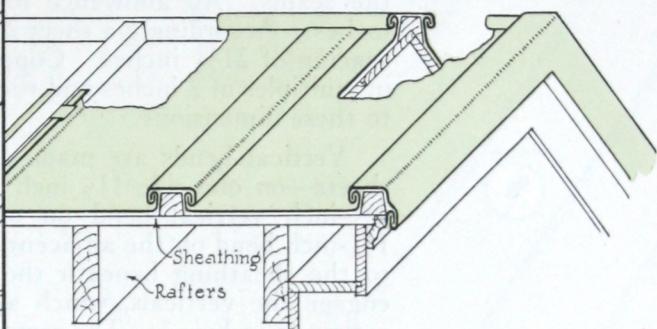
DETAIL SHOWING APPLICATION OF RIBBED SEAM COPPER ROOFING
